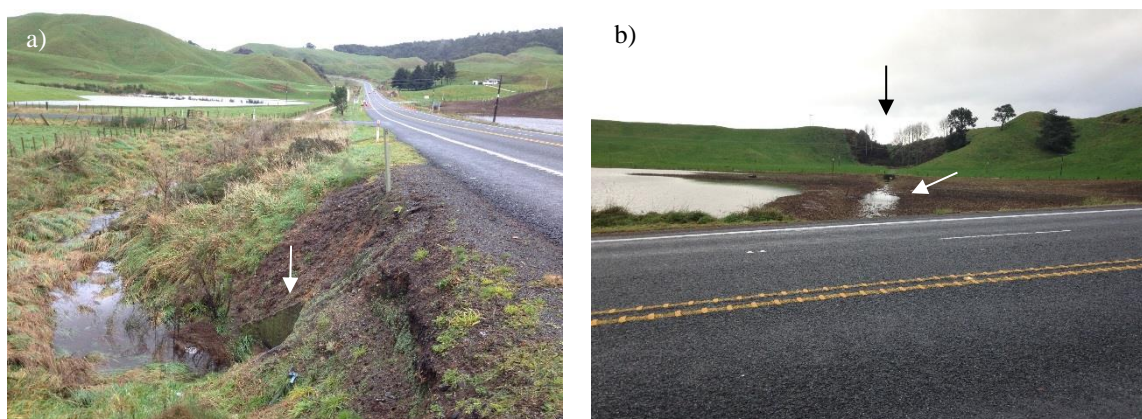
The existing surface drainage is too high to drain water ponding in the area. a) Culvert (as indicated by arrow) supposed to drain water from ditch on the east side of the road to swale on west side. b) Swale (white arrow) supposed to drain water to gully downstream (black arrow).
